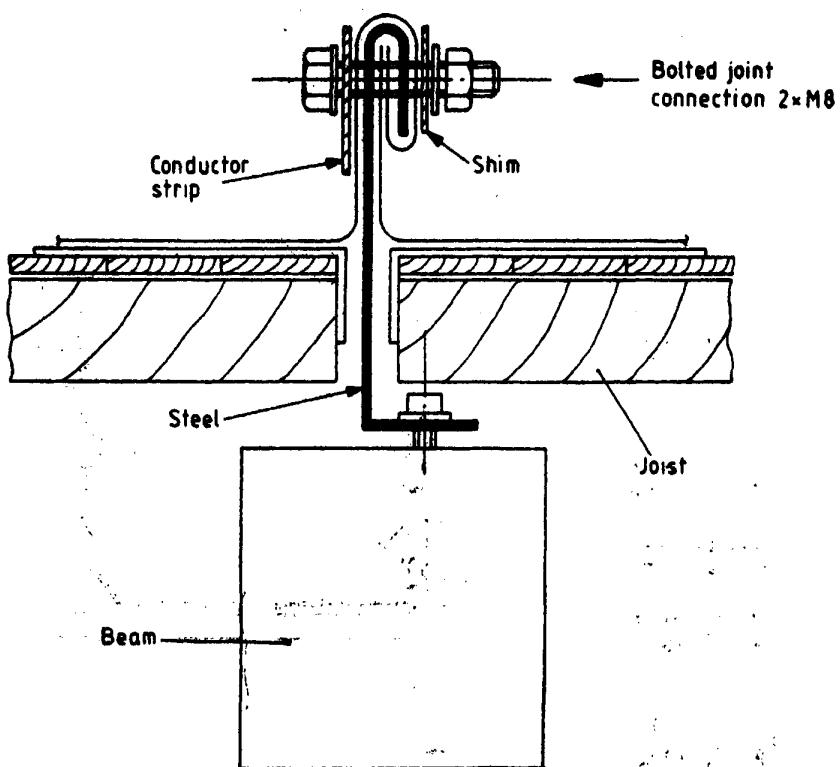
A AIR TERMINATIONS AND DOWN CONDUCTORS FOR FLAT ROOF BUILDINGS WHERE THE AIR TERMINATION CONDUCTORS HAVE A PVC OVSHEATH
